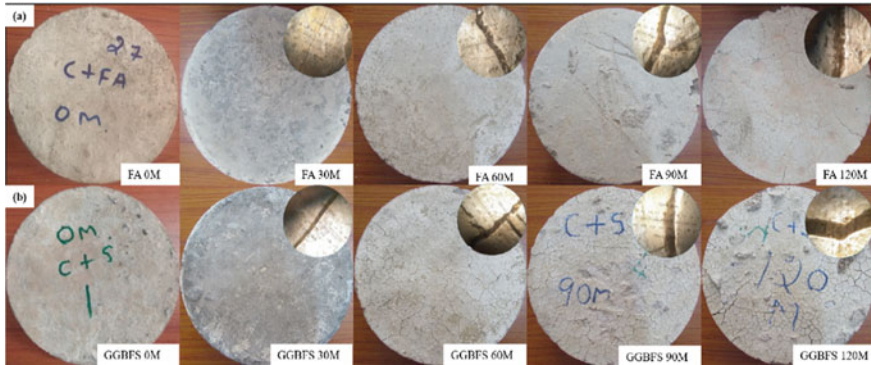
View of thermal crack width (Unheated and heated SCC specimens). a FA-SCC specimens. b GGBFS-SCC specimens
